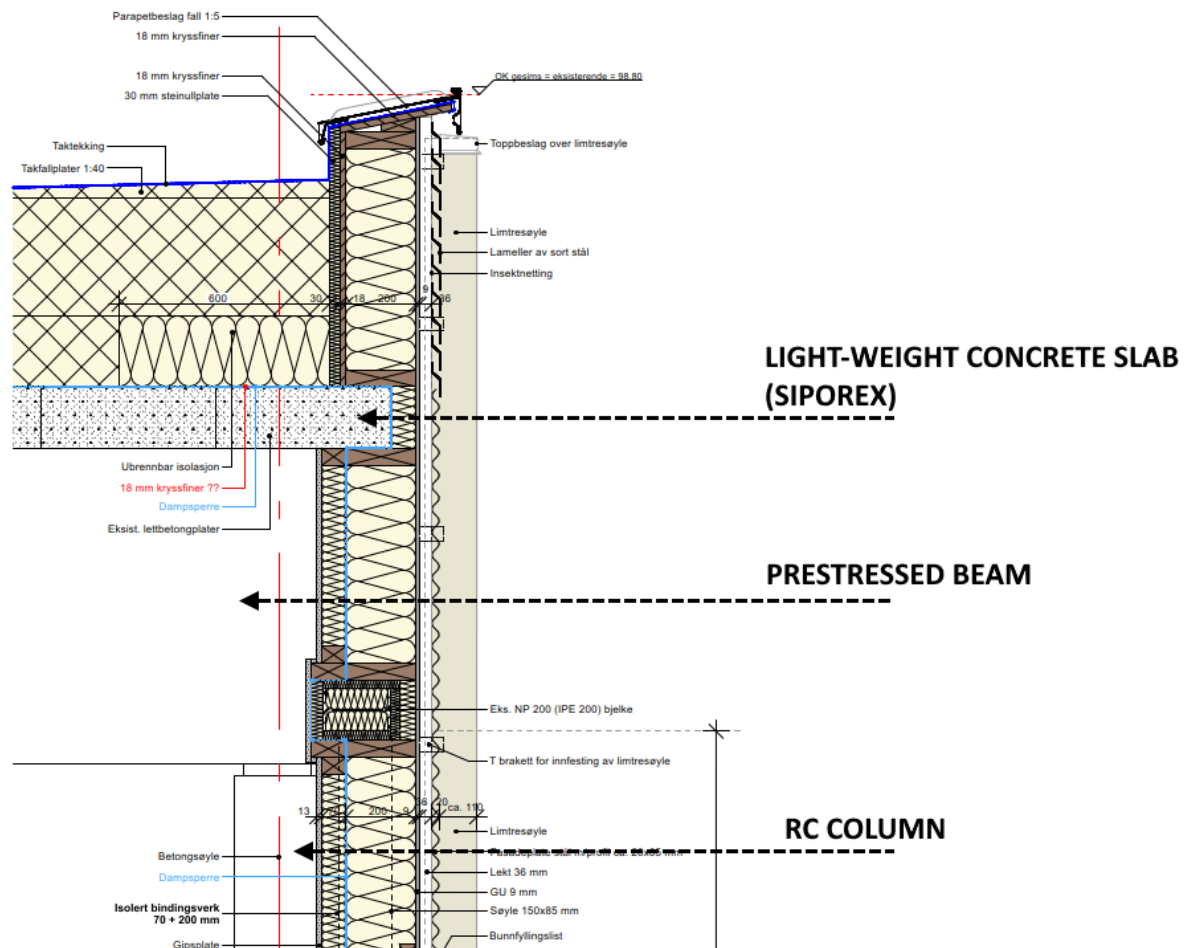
New building façade section where the terrace build-up above the prestressed beam is defined.
